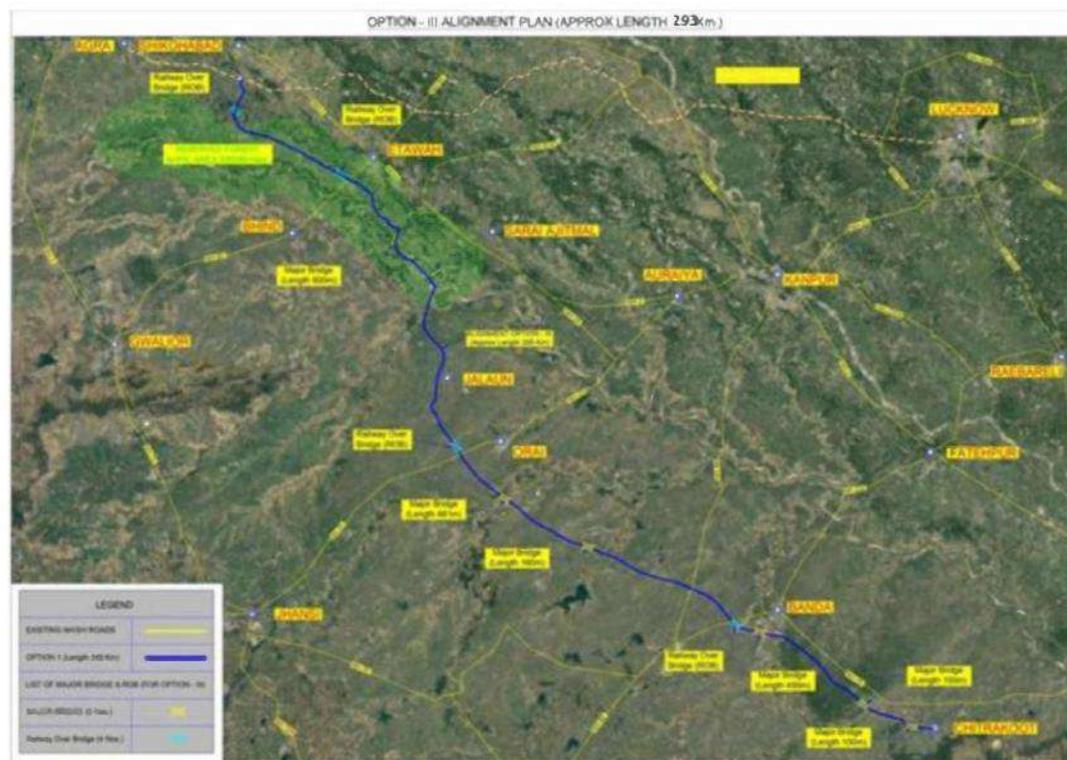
Alternate-3 – Alignment plan (Approx. Length 293 Km)
